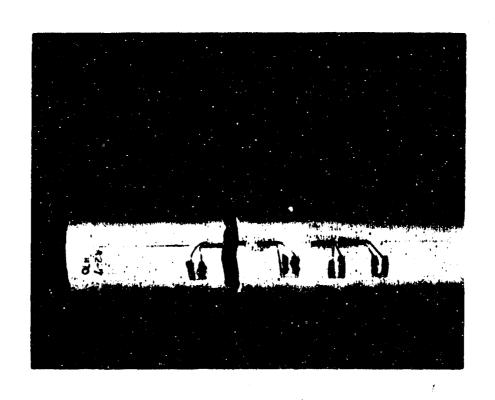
TYPICAL FRACTURE OBTAINED BETWEEN GAGES OF INSTRUMENTED CONCRETE SPECIMEN, BAR #70, A-2/7 AGGREGATE
